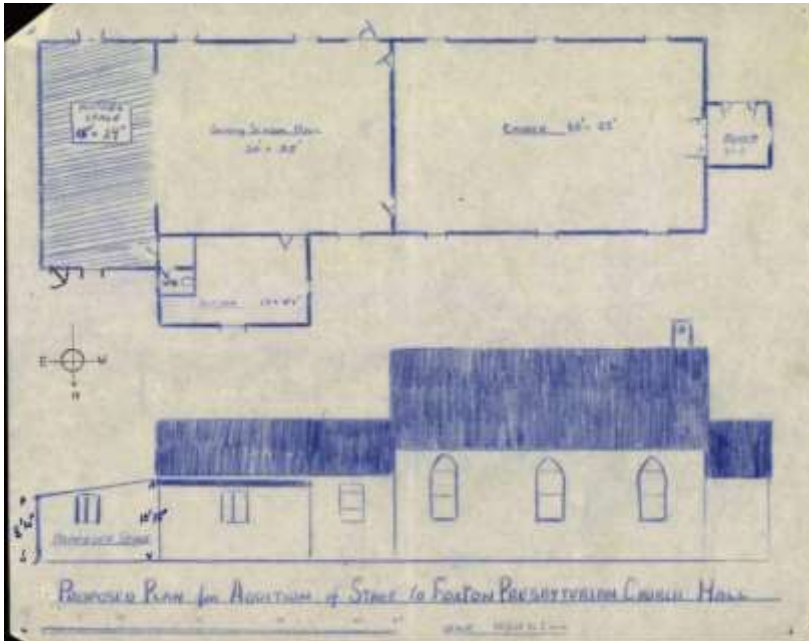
The layout of Foxton Presbyterian Church in 1954, when a stage was being added to the Sunday School Hall. The small belfry was also drawn into this plan. (Source: Horowhenua District Council, Building Permit records for the building)
